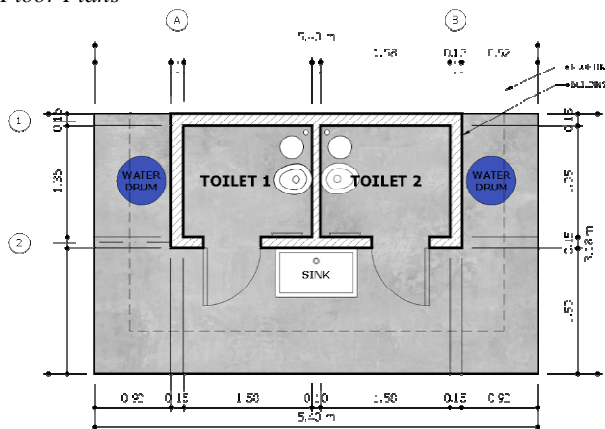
Floor Plan of Two-Section Sanitation Facility
